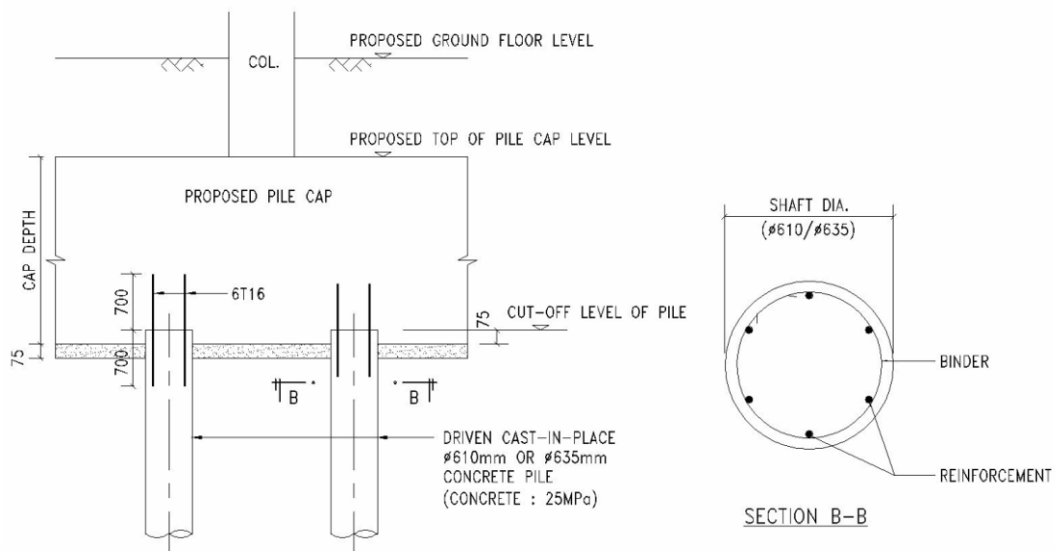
Pile Head Details of a Driven Cast-in-Place Pile
